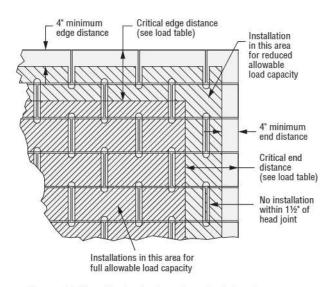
Allowable Anchor Locations for Full and Reduced Load Capacity When Installation Is in the Face of Fully Grouted CMU Masonry Wall Construction
